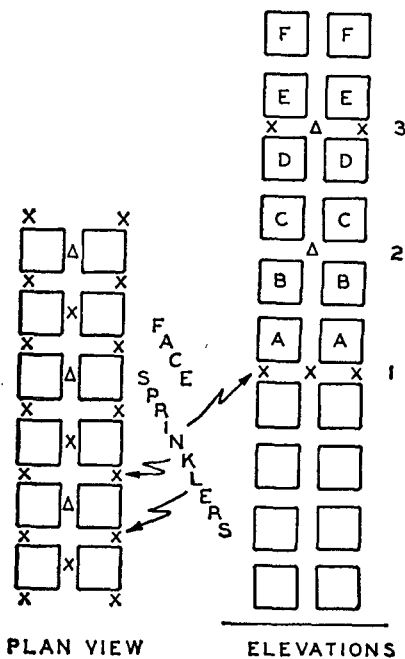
In-Rack Sprinkler Arrangement, Class I, II or III Commodity, Height of Storage over 25 feet
